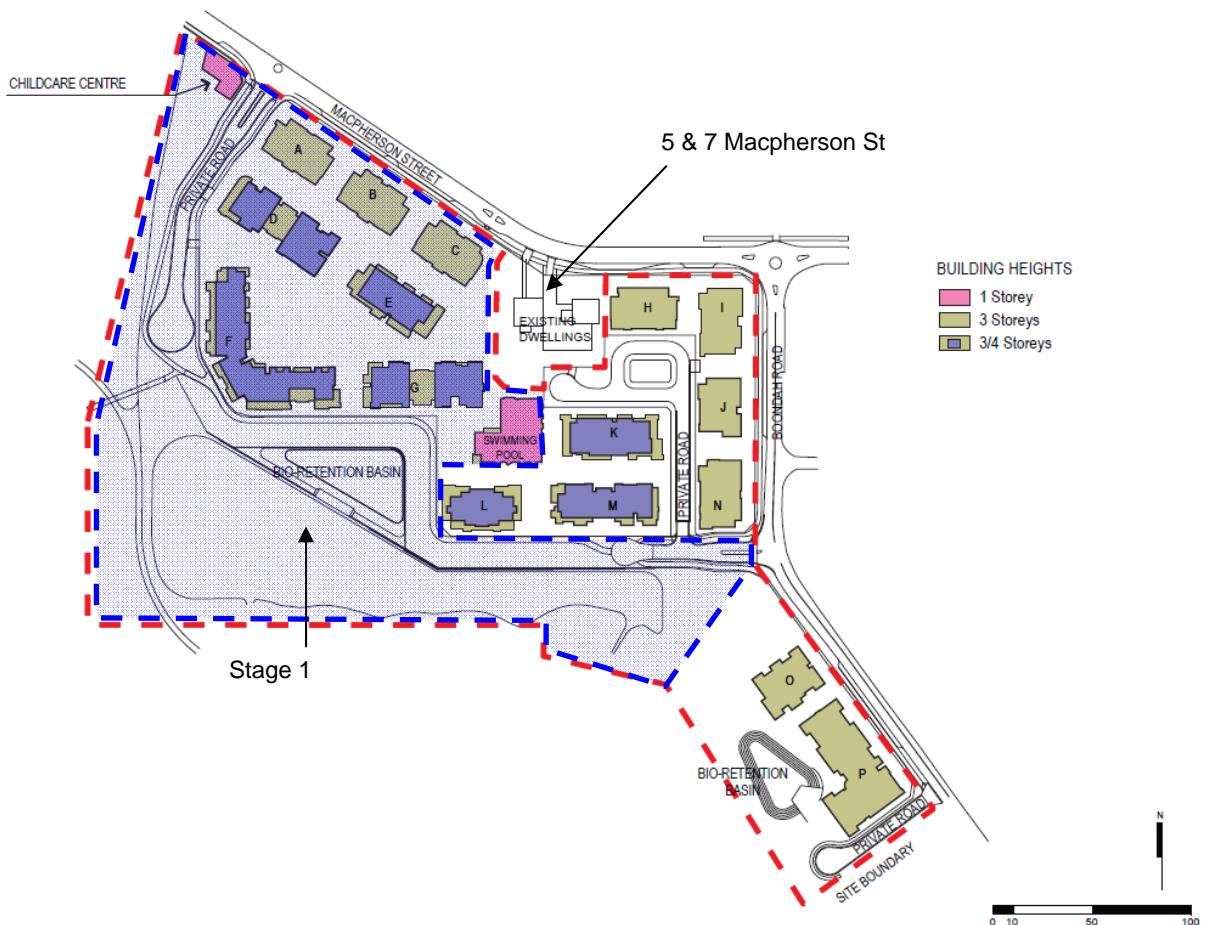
The Approved Concept Plan Layout (as modified) (Base Image Source: Meriton Apartments, 2011)
